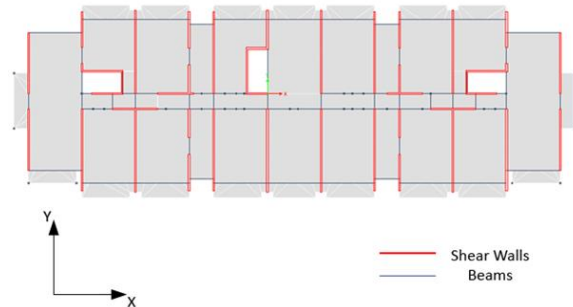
Schematic Plan View of Building D (Rectangular Building)
